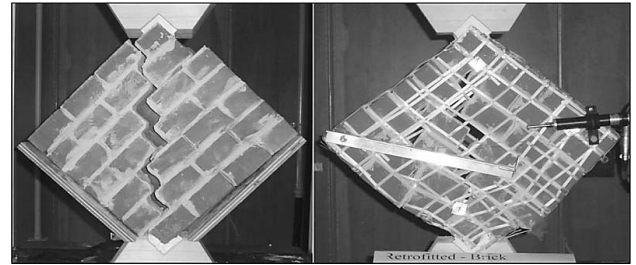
Failure patterns of brick masonry wallettes with and without retrofitting by PP-band mesh
